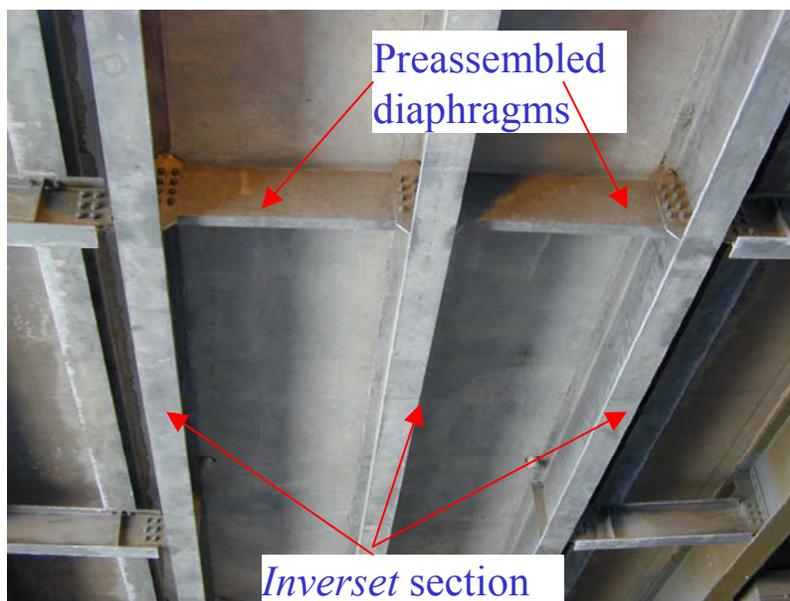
Inverset*™ section installed in the Tappan Zee Bridge.
